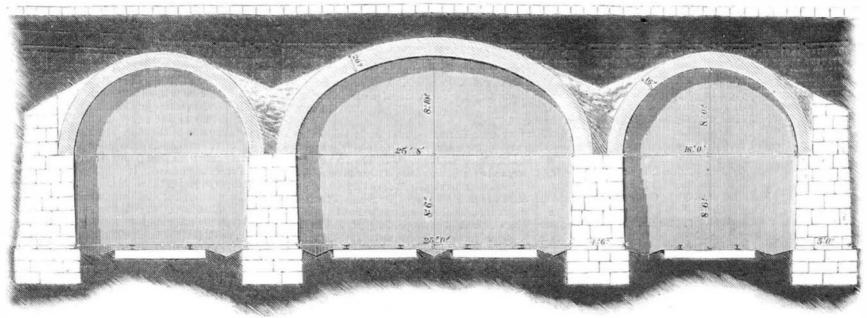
THE UNDERGROUND RAILWAY IN NEW YORK.-CROSS SECTIONS OF THE MASONRY TUNNELS.
